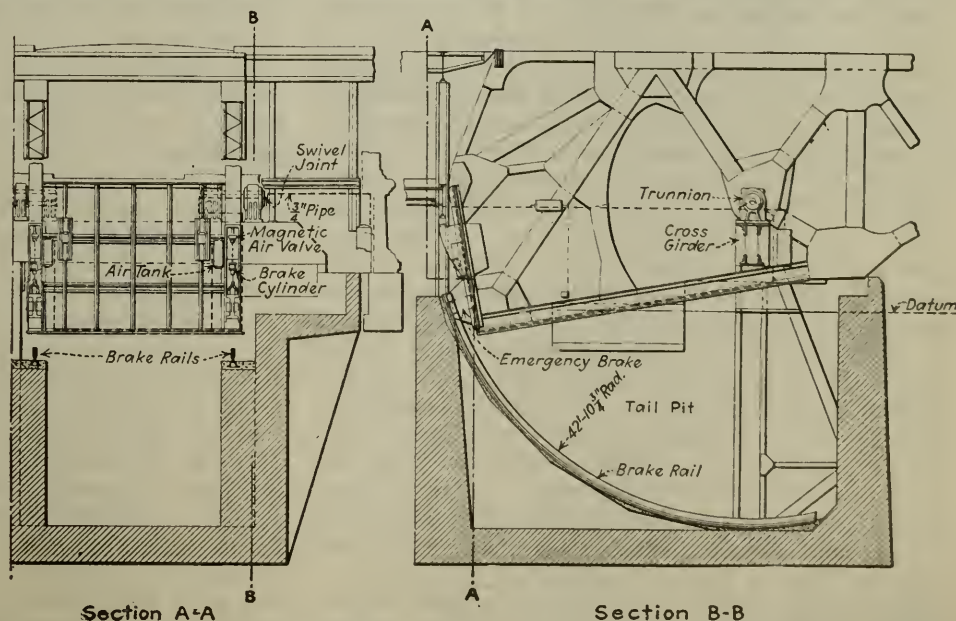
EMERGENCY GRIP BRAKE ON HEEL OF BASCULE
